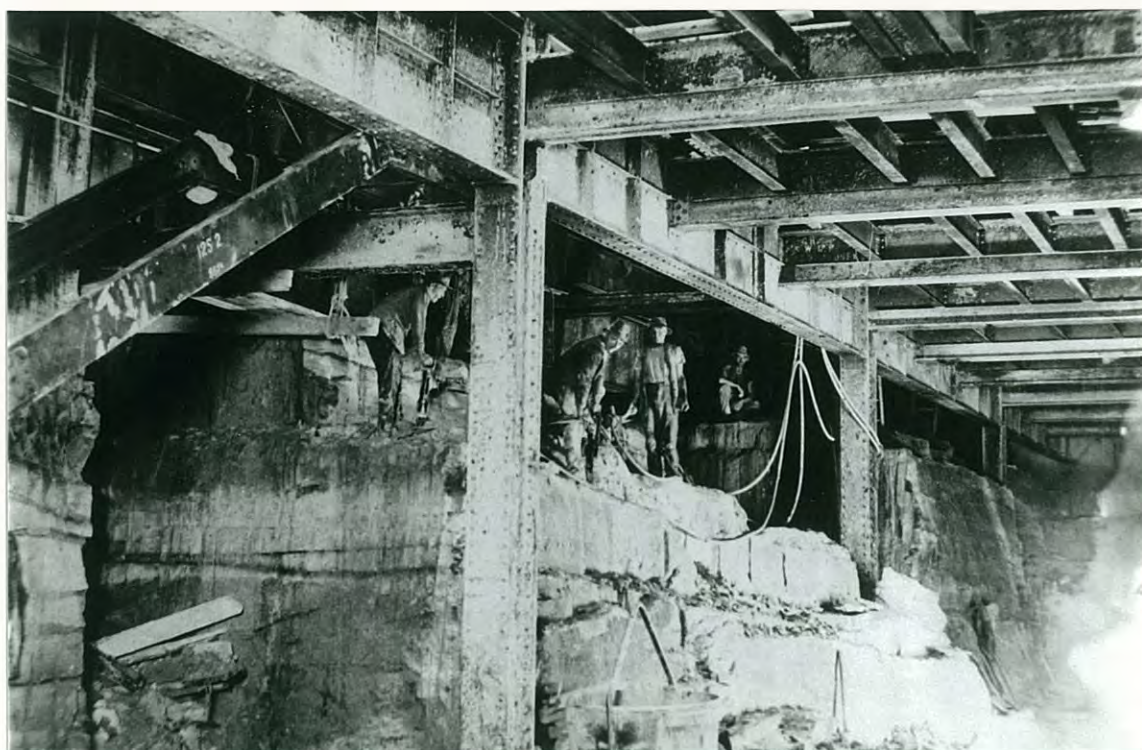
After George Street was restored in late 1931, excavation for Town Hall Station continued under cover, around the steel frame of the station building.
